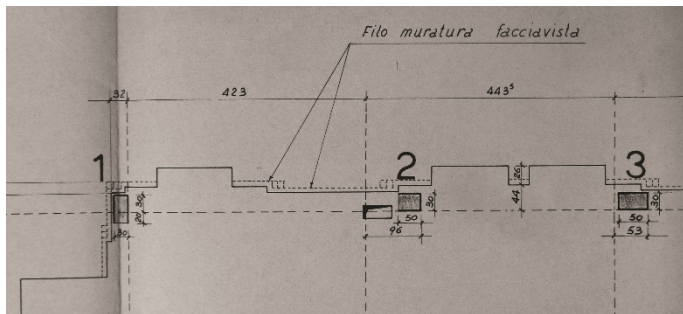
Joist slabs shaped to follow the outline of the façade (Borini’s bottom structural plan, detail 1:50) (ATC, 14563).
